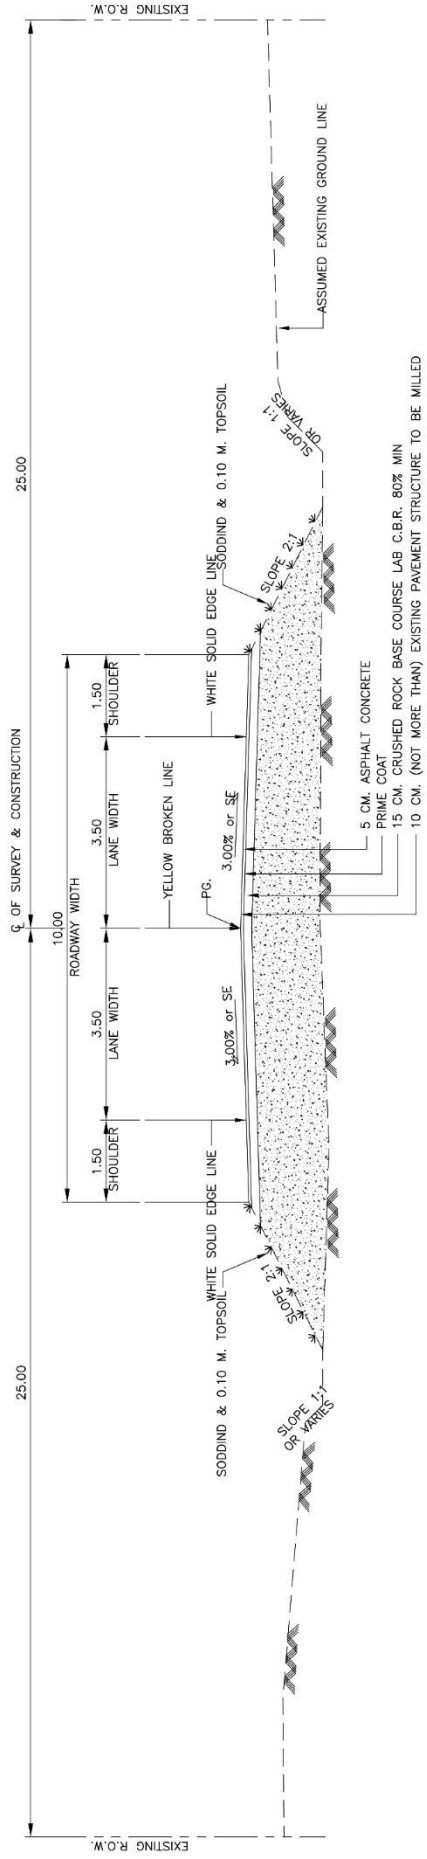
Typical Sections: Sta. 29+100– Sta. 56+900 and Sta. 57+300 – Sta. 131+460
